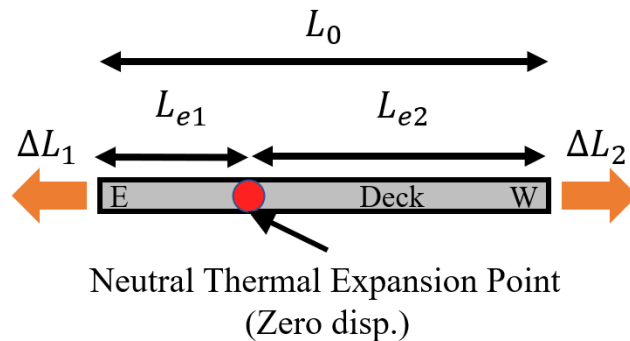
Diagram showing neutral thermal expansion point and effective expansion length for each abutment wall.
